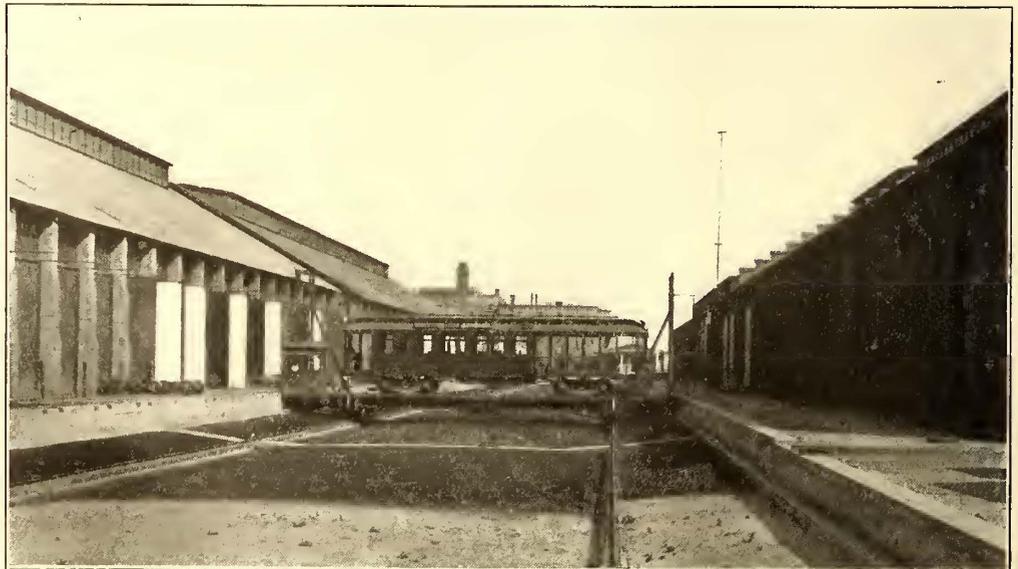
TRANSFER TABLE BETWEEN ROWS OF SHOP BUILDINGS
